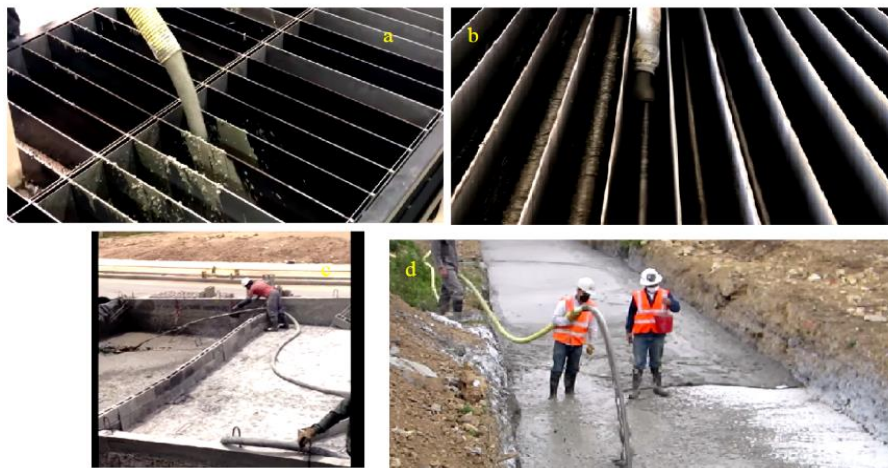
Application of foam concrete in blocks; (a) panels, (b) ground, (c) stabilization, (d) bridge abutment.
